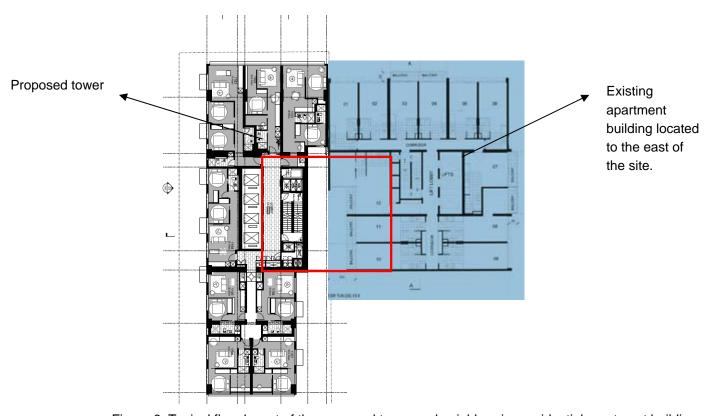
Typical floor layout of the proposed tower and neighbouring residential apartment building located at 175-181 A'Beckett Street. The red area shows the 202m high wall which will be constructed opposite the windows and balconies of the apartments of the existing apartment building.
